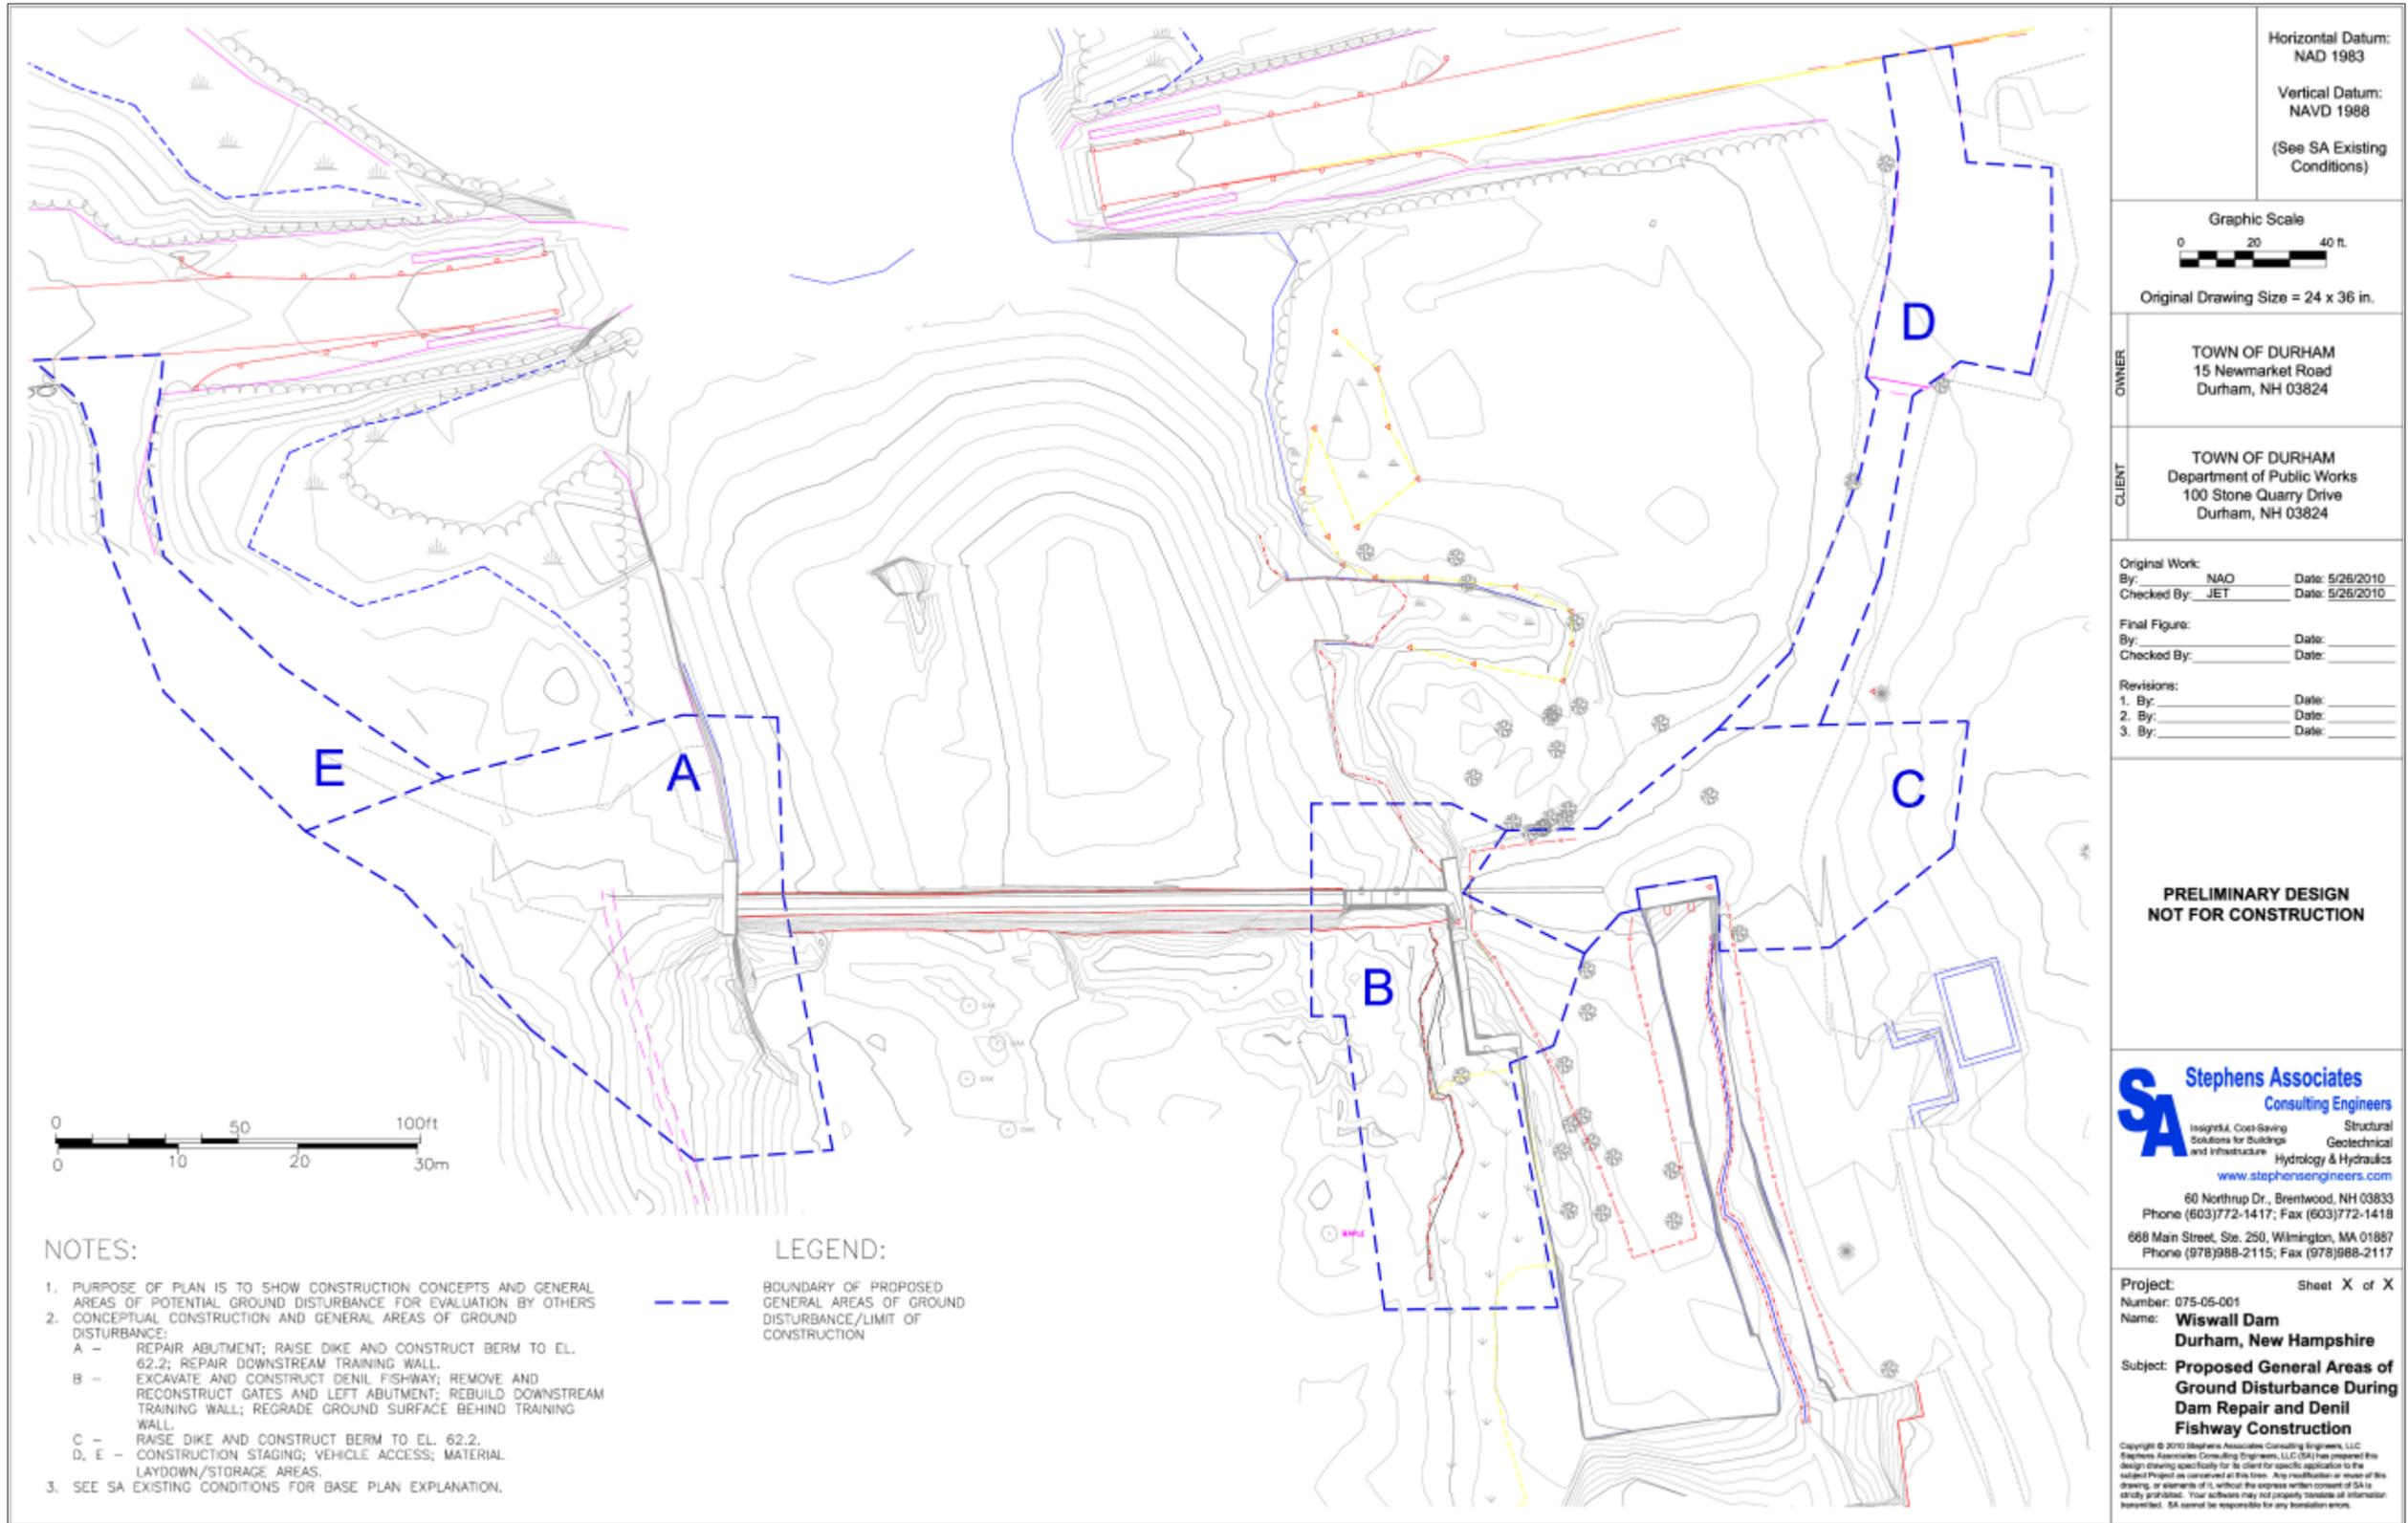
Plan of the proposed Wiswall Dam Fish Passage project area.
